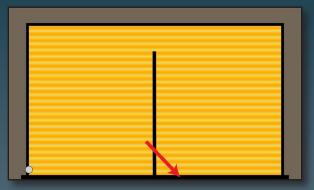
Interlocking slats may be riveted together on the ends which may will prevent them from being pulled out
